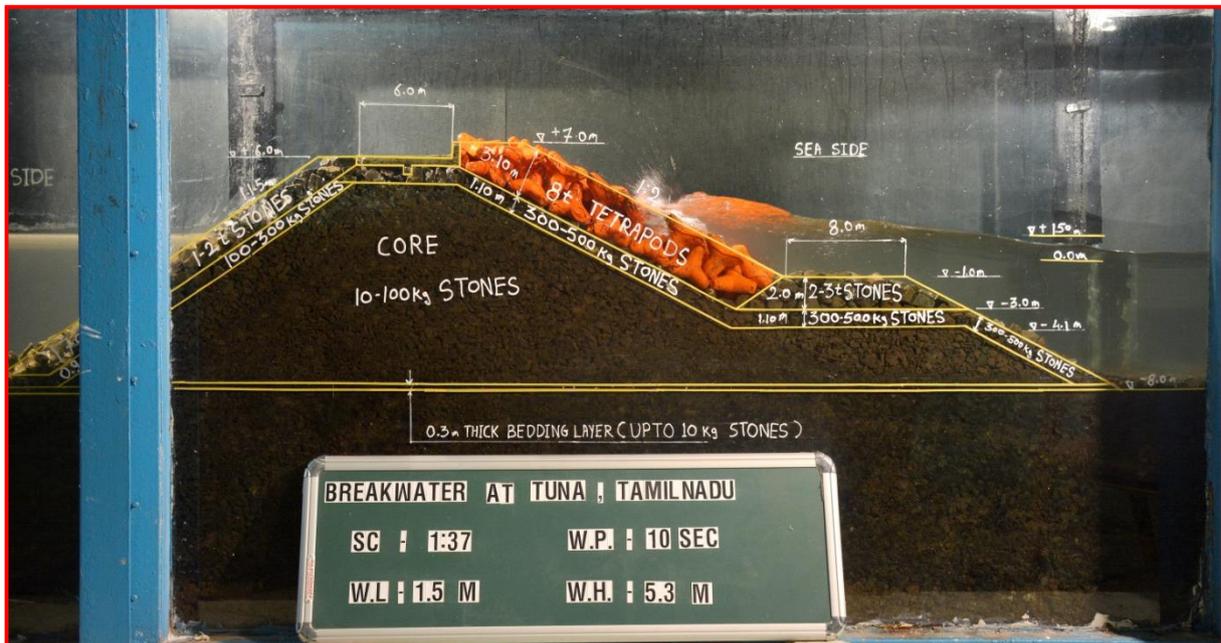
Wave action on armour layer of breakwater consisting of 8 t tetrapods at -8.0 m bed level with +1.5 m water level and 5.3m wave height
